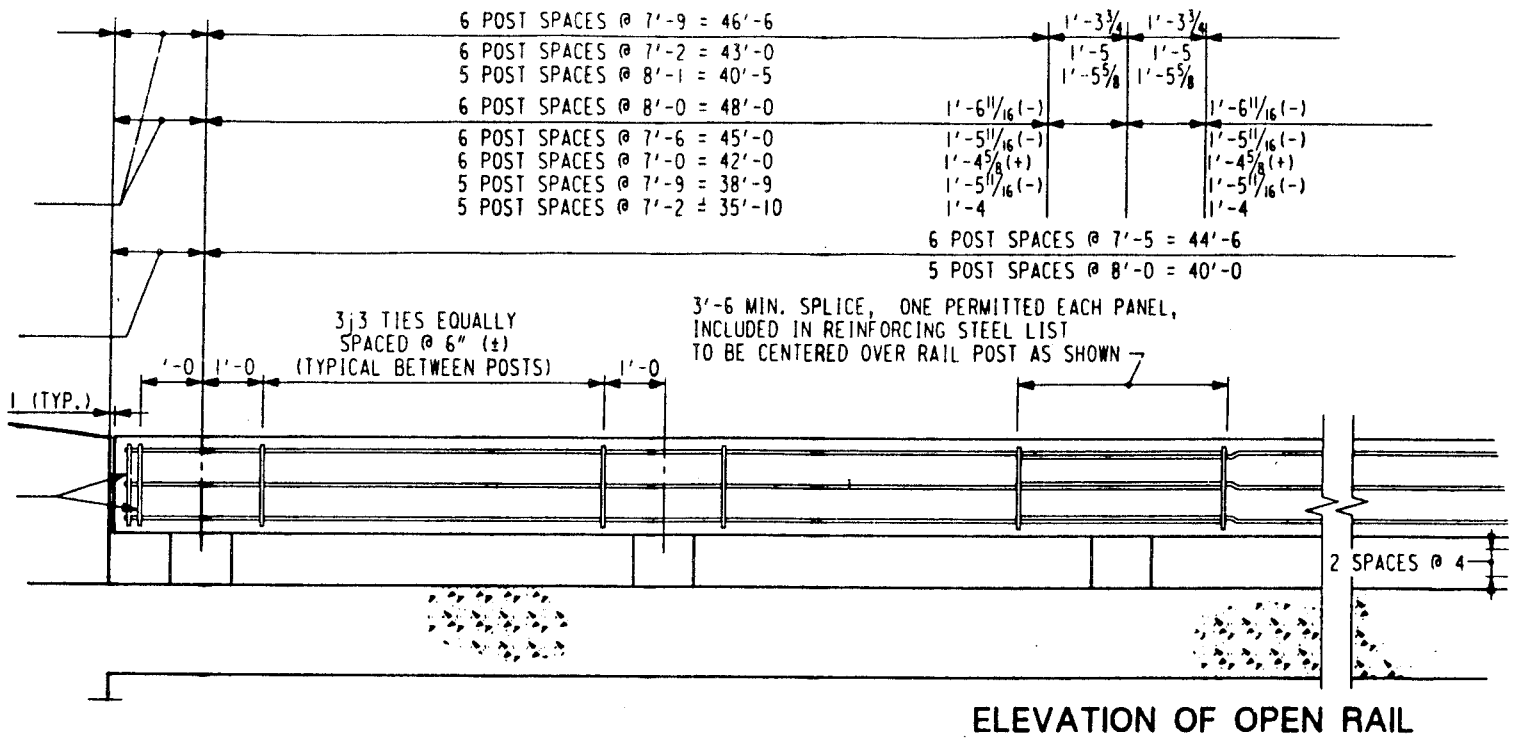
Iowa Concrete Beam and Post Bridge Railing (54).
